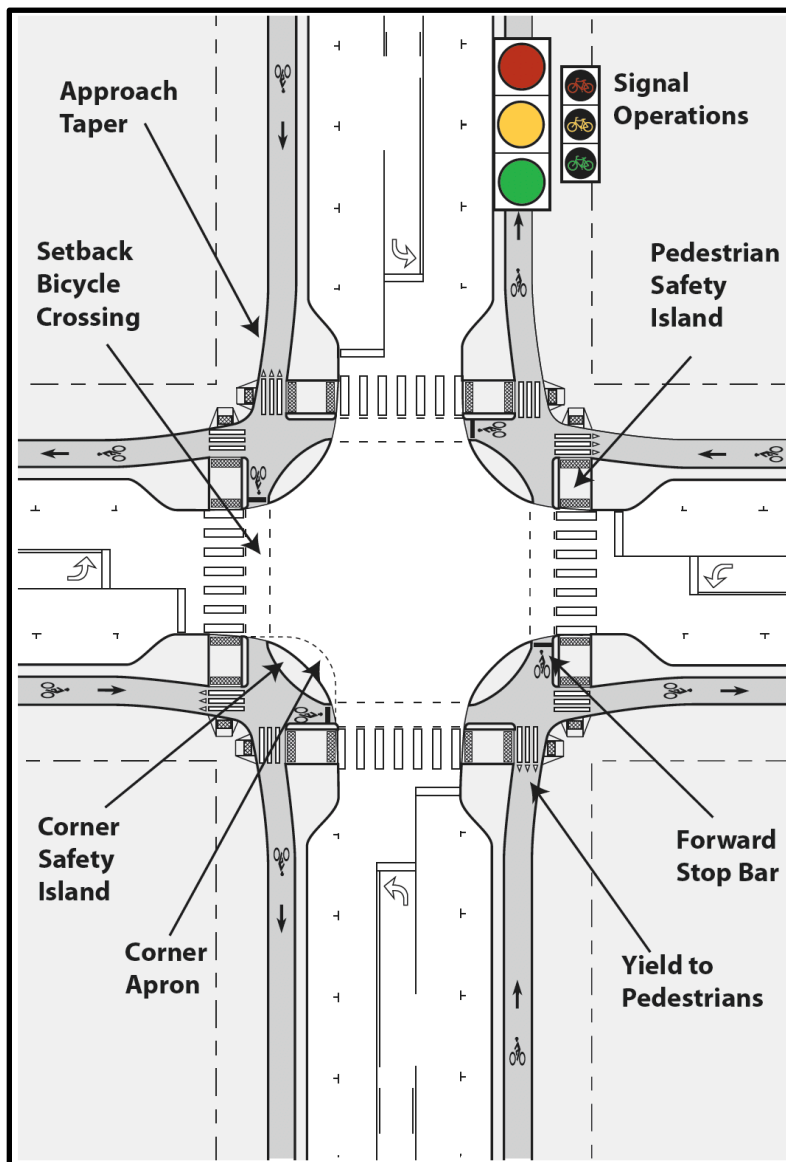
A protected intersection geometry with key elements highlighted. *Image credit Alta Planning & Design.*³
